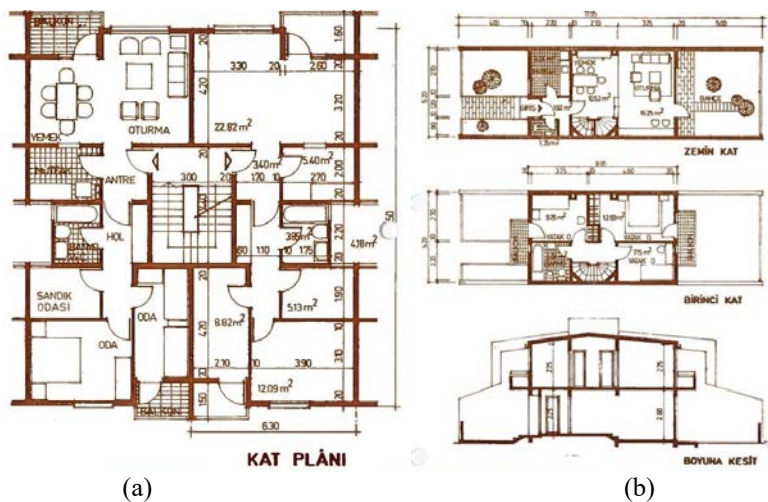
Sample plans of different housing types constructed in Batikent. (a) Plan of an apartment; (b) Plans and a longitudinal section of a duplex house with garden. (Source: Archive of MESA Construction Company.)
